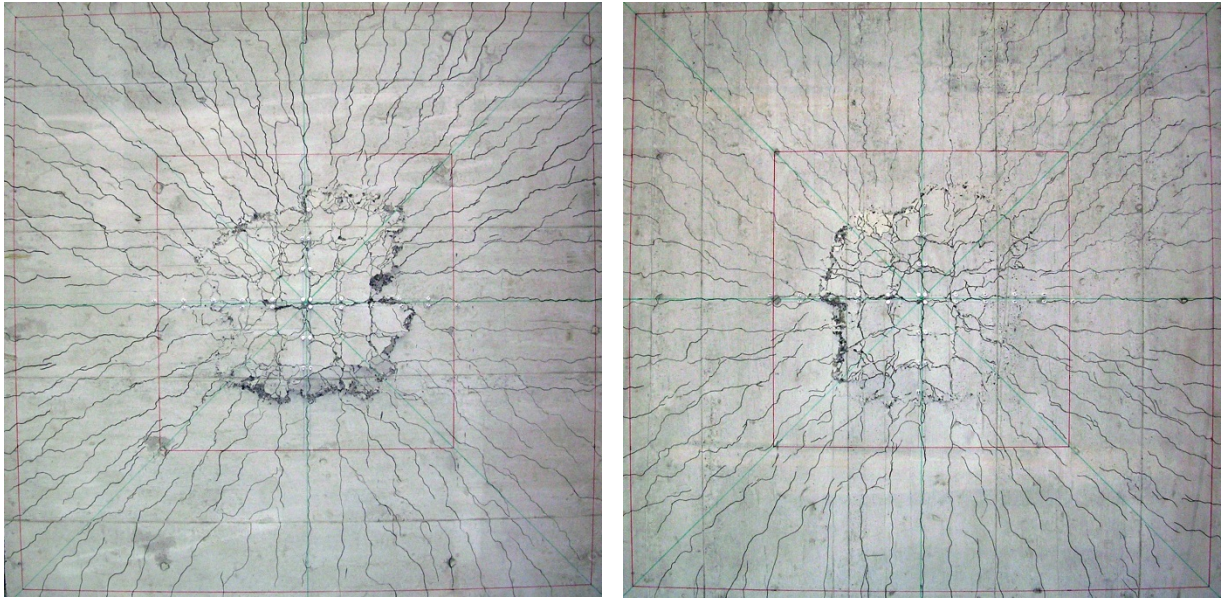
Cracking pattern of plain concrete SFRC slabs DA-fm 40 (on left) and DA-fm 60 (on right)
